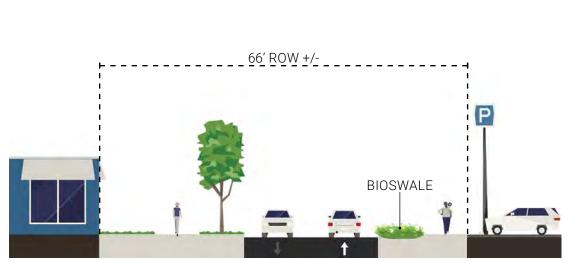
PROPOSED STREET IMPROVEMENTS
